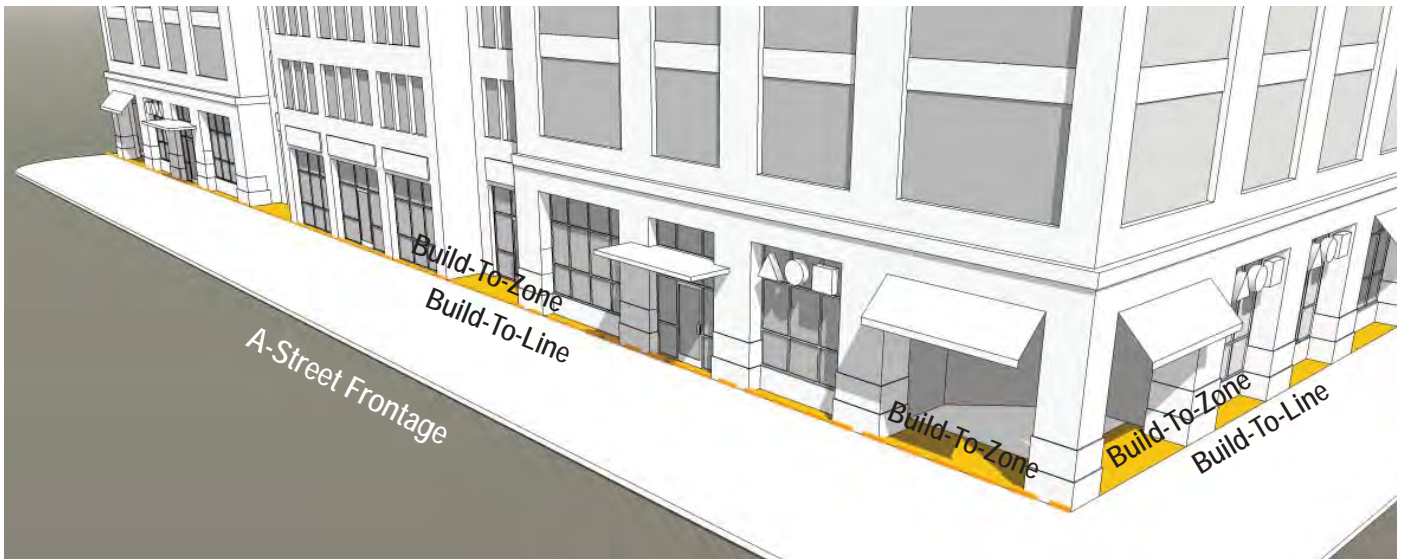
Street Frontages showing a typical Five Foot Build-To-Zone at an A-street
